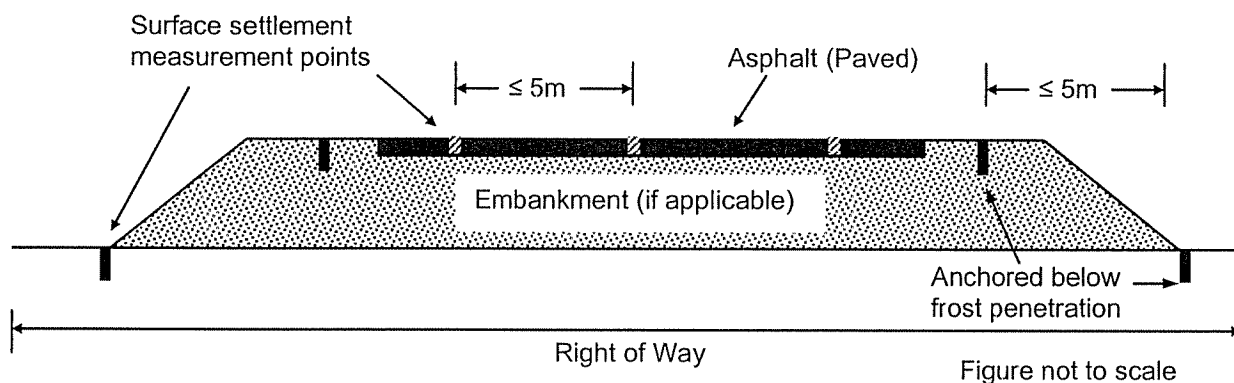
Typical configuration of surface settlement monitoring points along the tunnel alignment.
